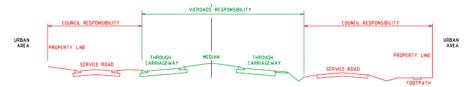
Demarcation Arrangements for Typical Rural Arterial Roads
